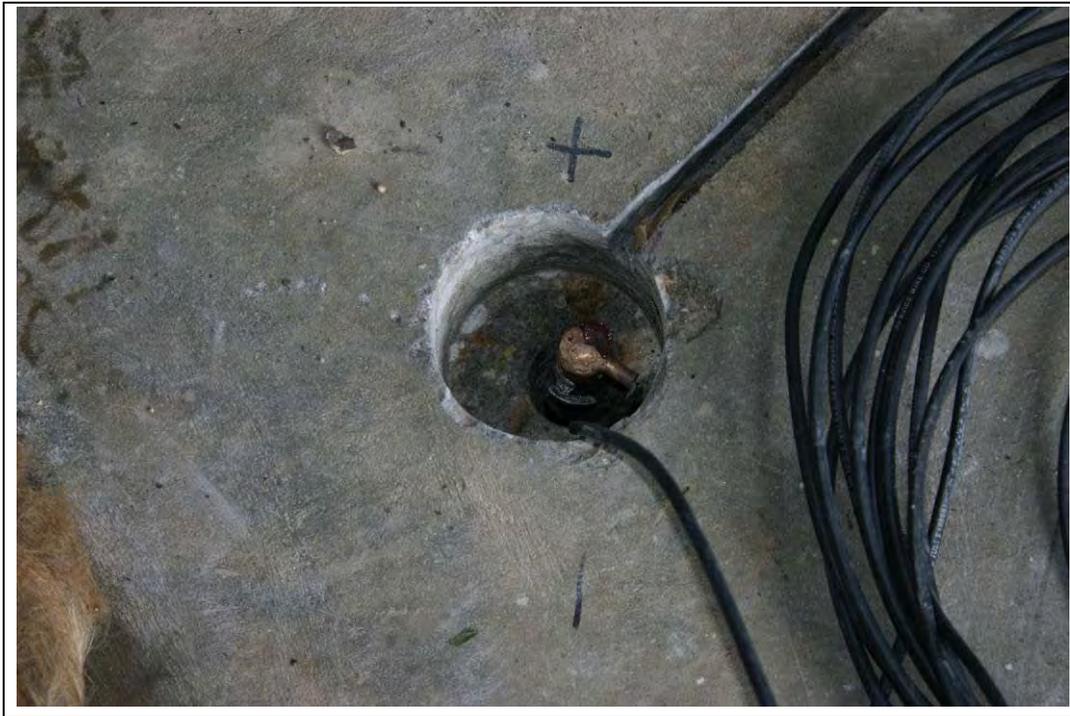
Cathode lead wire exothermic weld connection.
